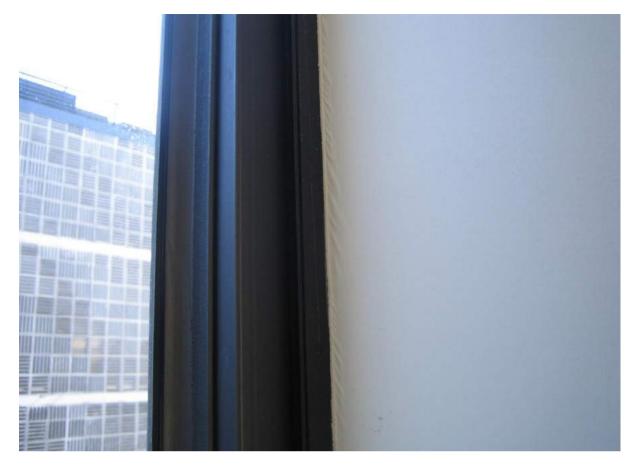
Water penetration in window in the N/E corner of bedroom 1 to Unit 205.
